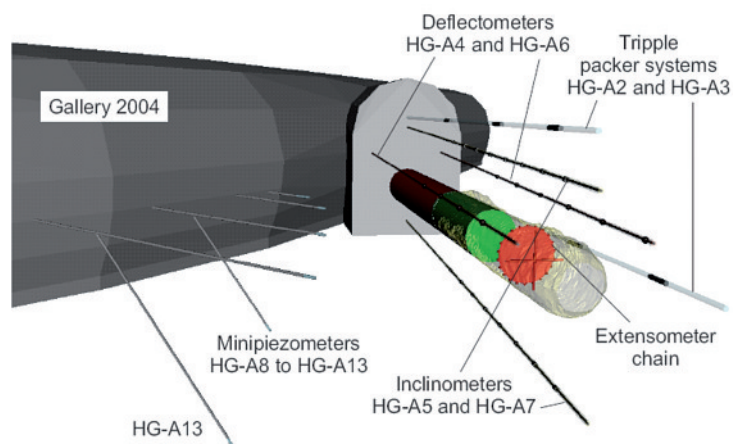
3D Layout of the HG-A experiment at Mont Terri showing the excavated micro-tunnel with the megapacker installed (in green) and the backfilled test interval (transparent). The instrumentation around the tunnel (boreholes) and inside the backfilled section (in red) are included.
